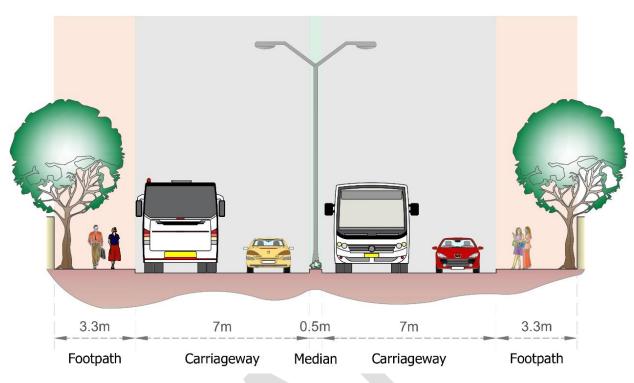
Typical Cross Section of 21m Wide Road with Footpath
